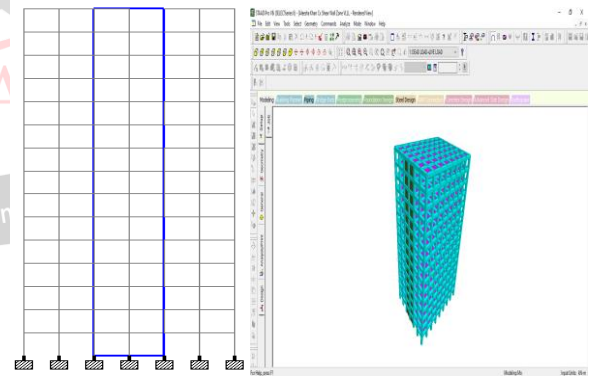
Framed building with Shear wall at the exterior side along X-direction.
